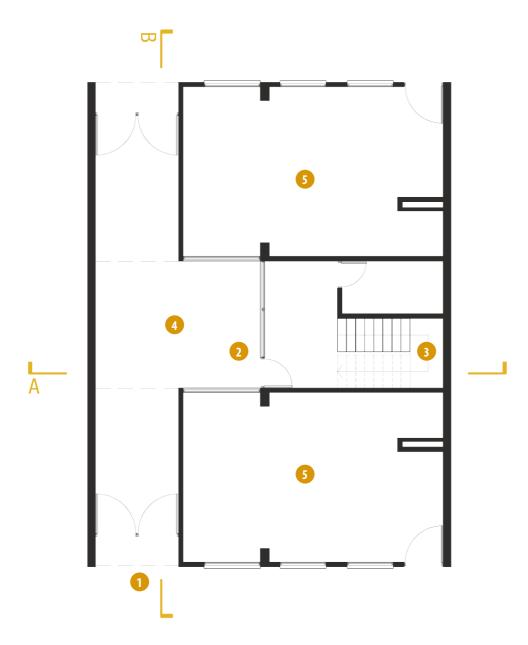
TYPOLOGY B\_GROUND FLOOR PLAN
